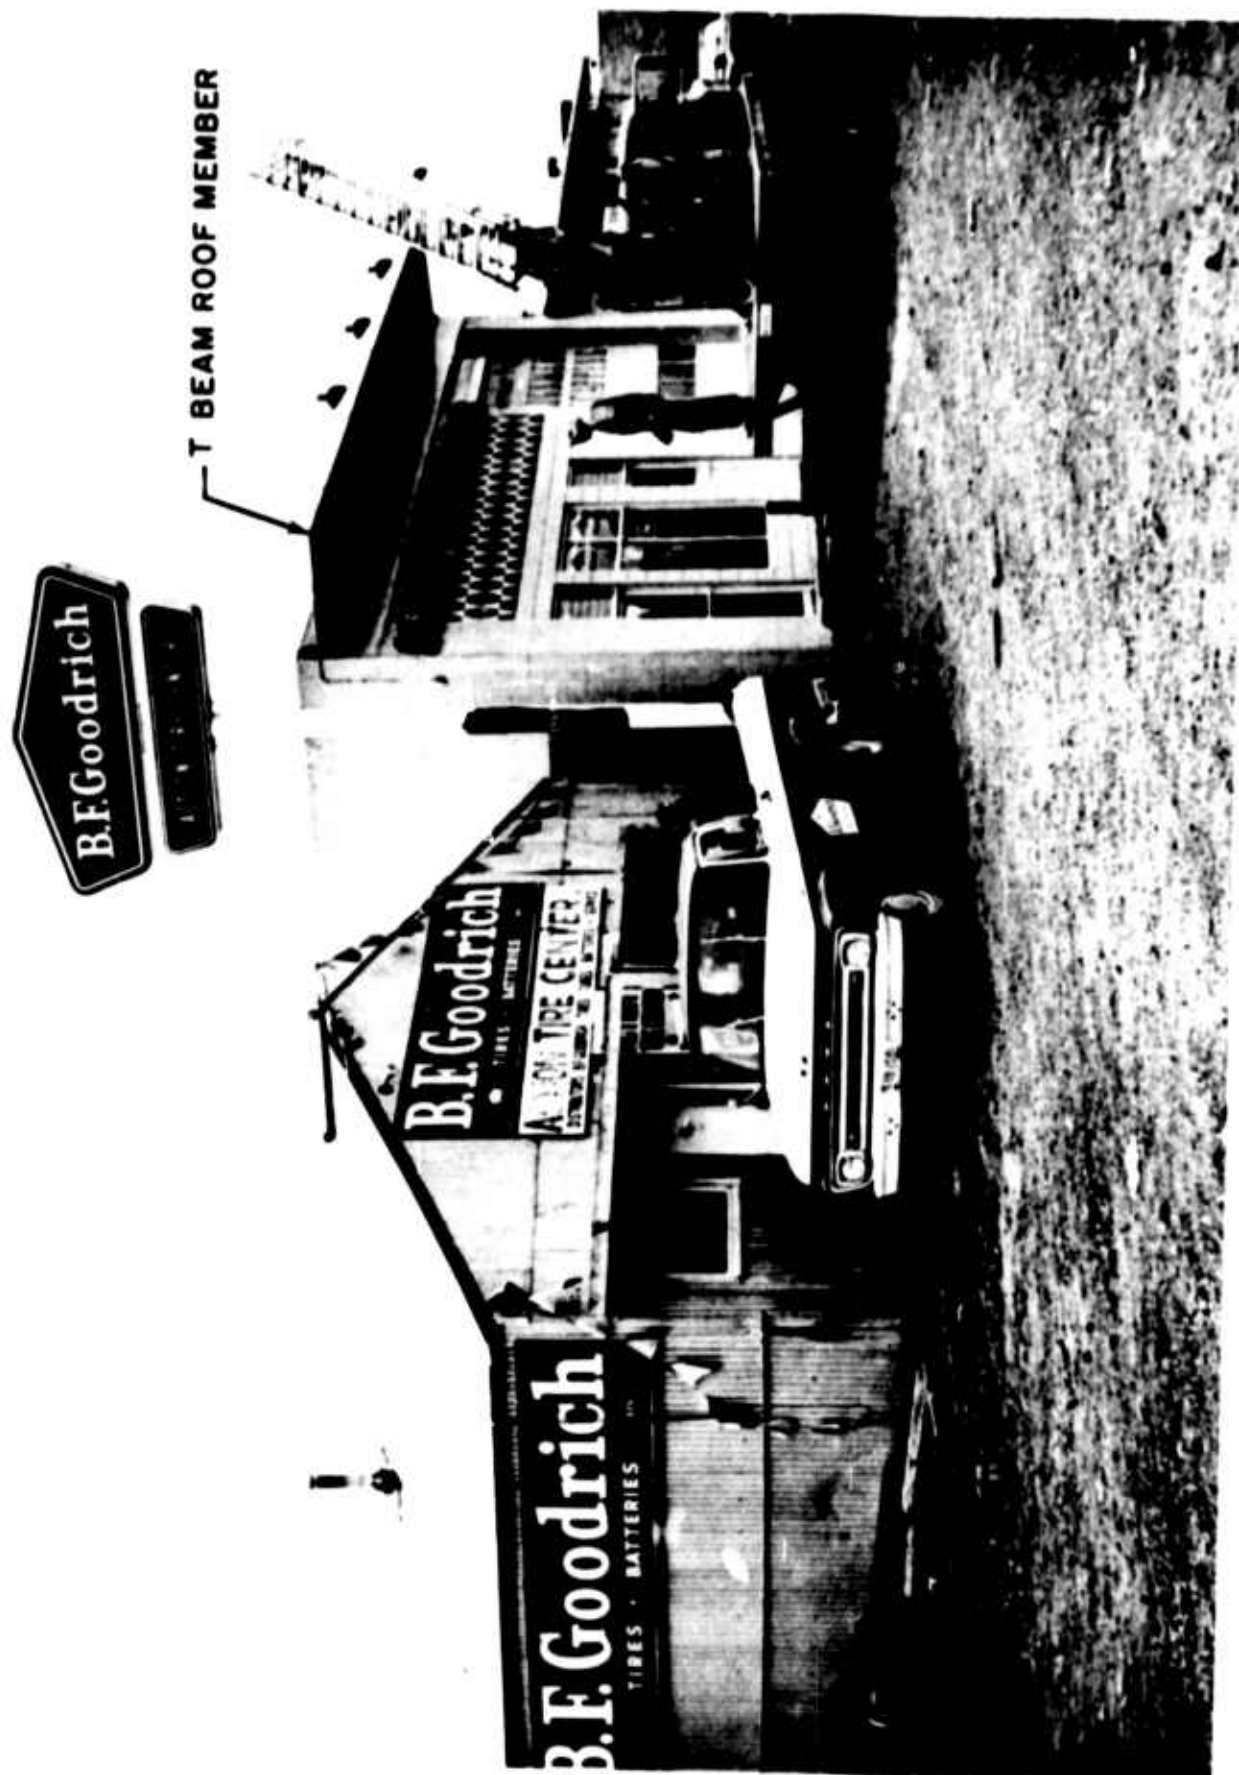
Action Tire Center (Undamaged building using a prestressed T-roof system a few blocks west of Fifth Avenue Chrysler Center)
